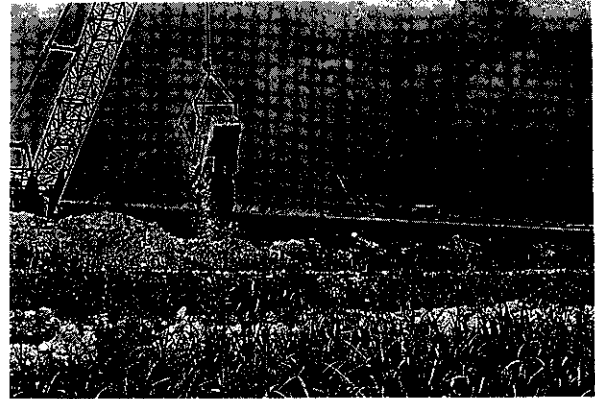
Dragline excavates fill material for construction of perimeter levee. Over 12 km of perimeter levee have been constructed in this fashion.
